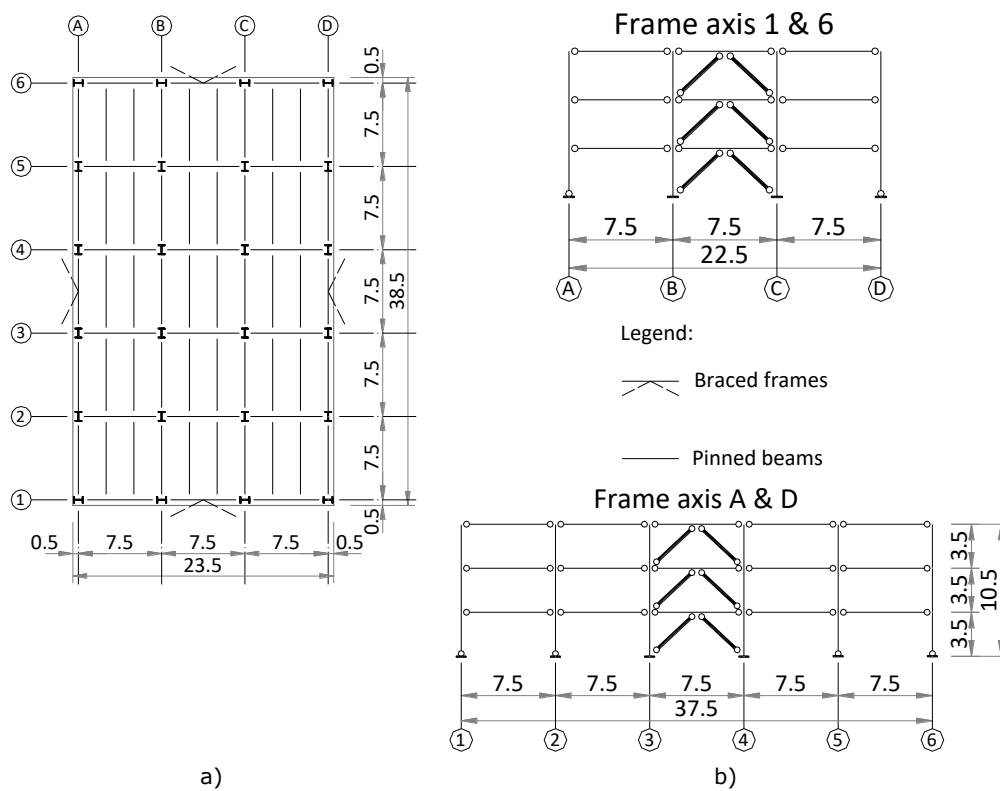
Reference structure *BL16*: a) plan and b) vertical layout
